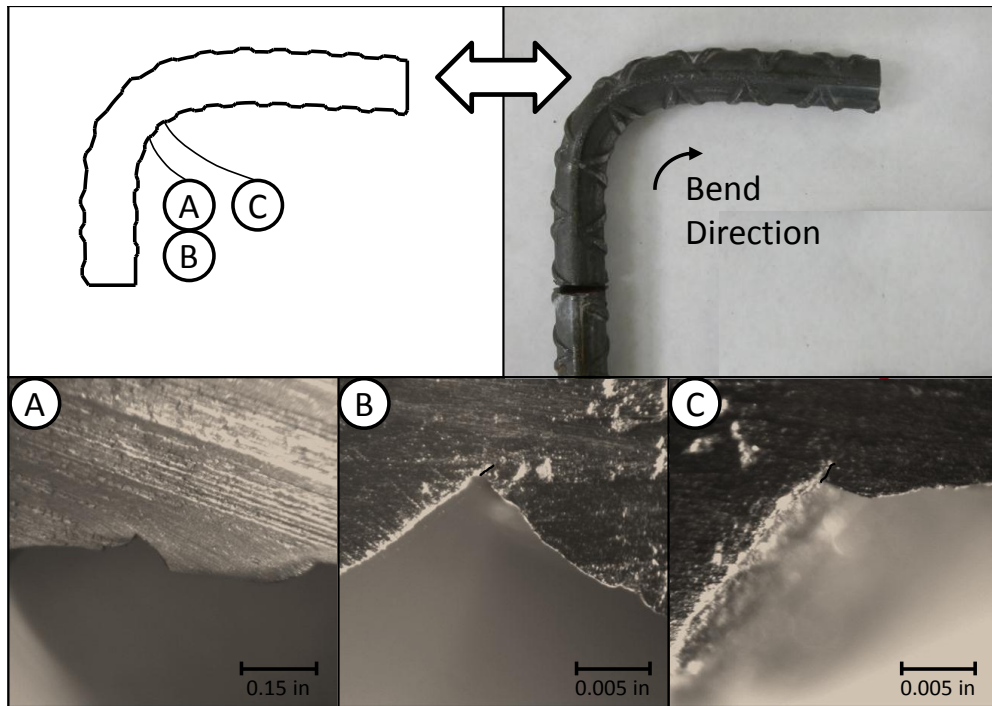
Cracks Identified After Bending for Specimen I-C-90-1.5-W
